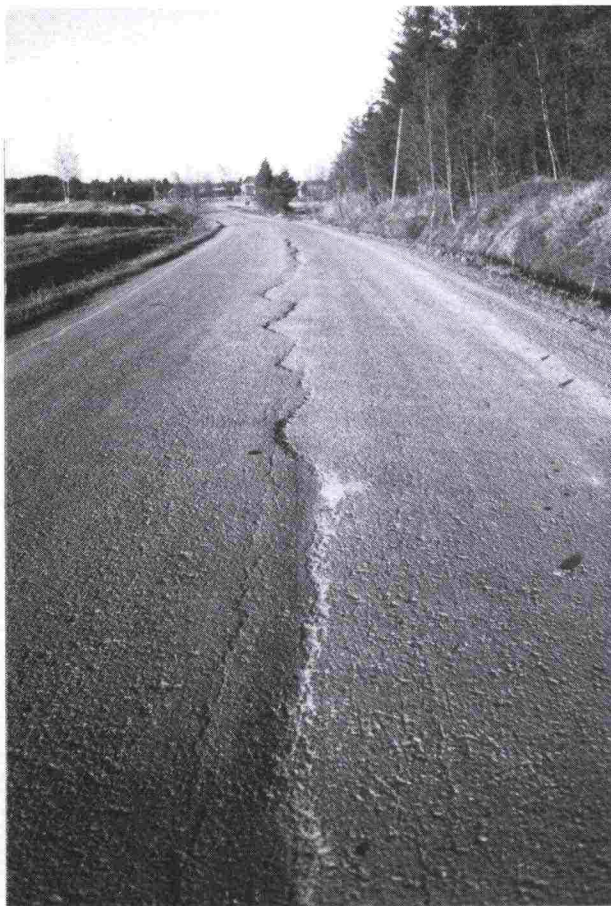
A longitudinal crack due to frost heave in the centre of road, an oil gravel pavement in southern Finland
